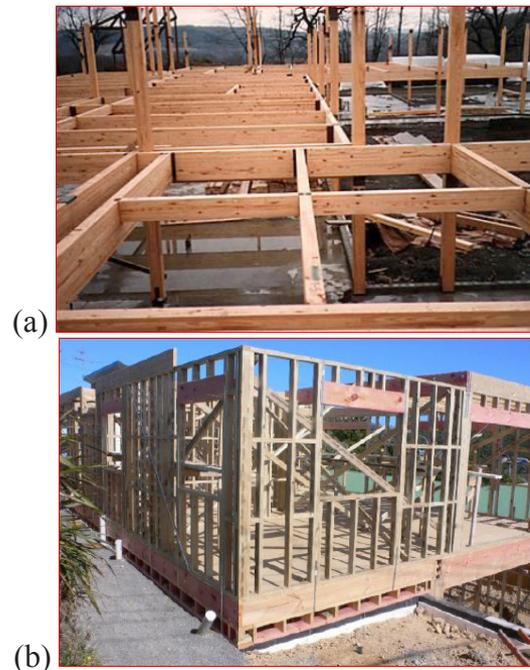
Structural solutions of multistorey timber buildings: (a) heavy framework's structure; (b) light framework structure [8] – [9].
